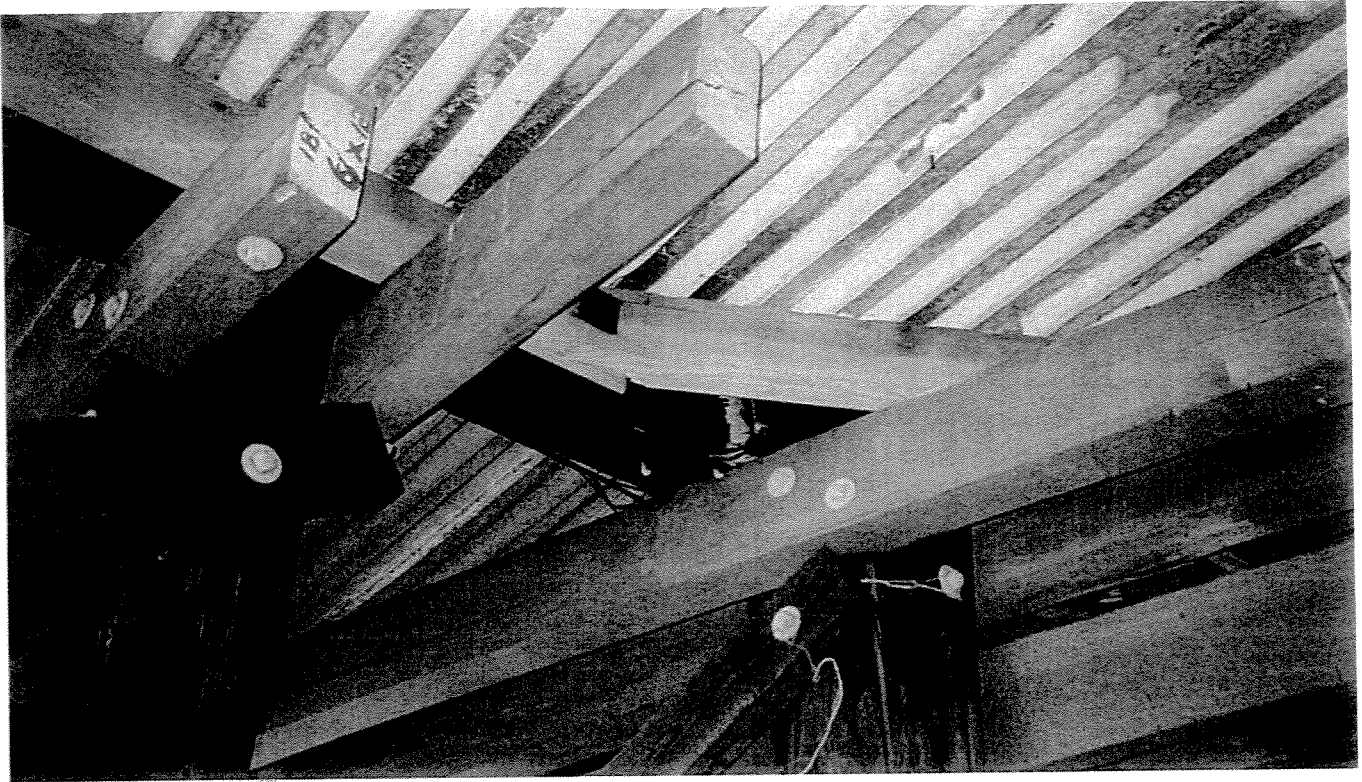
Bent 79, pile "C" and "D." Note break in timber cap at "D" with split pile and rotation of 6 x 12 horizontal timber bracing, looking SE.
